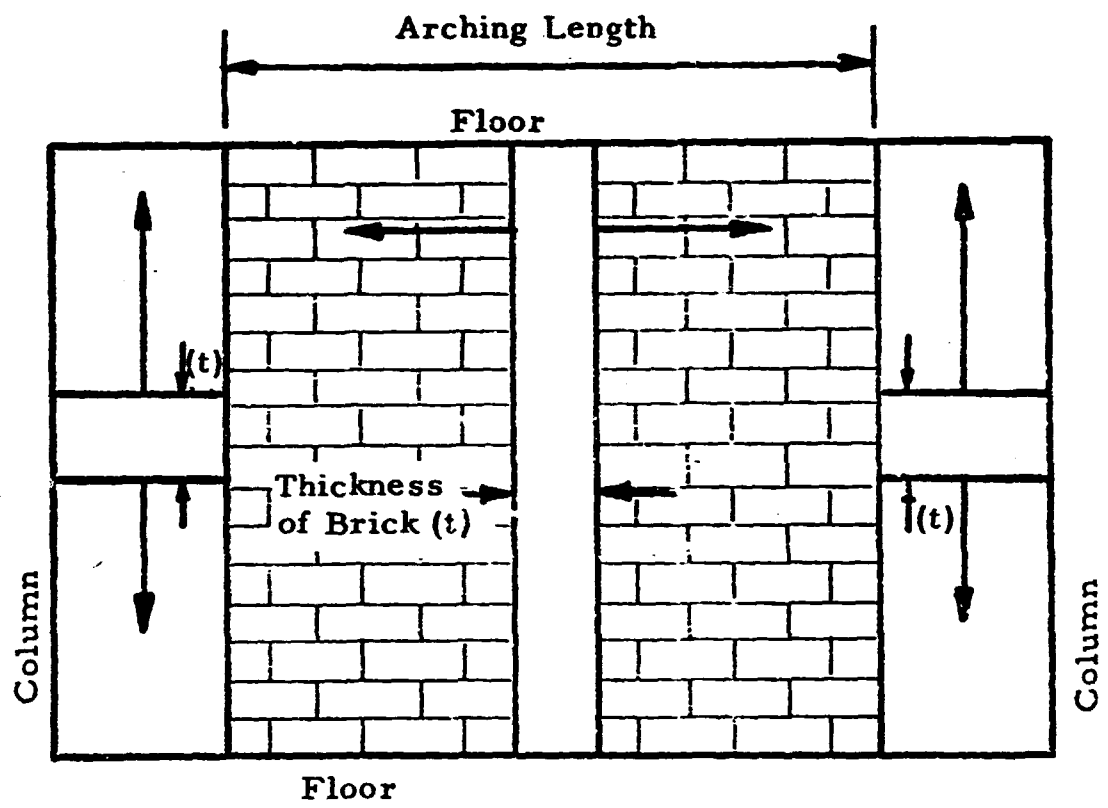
BEAM ANALOGY FOR A MASONRY PANEL FAILURE
